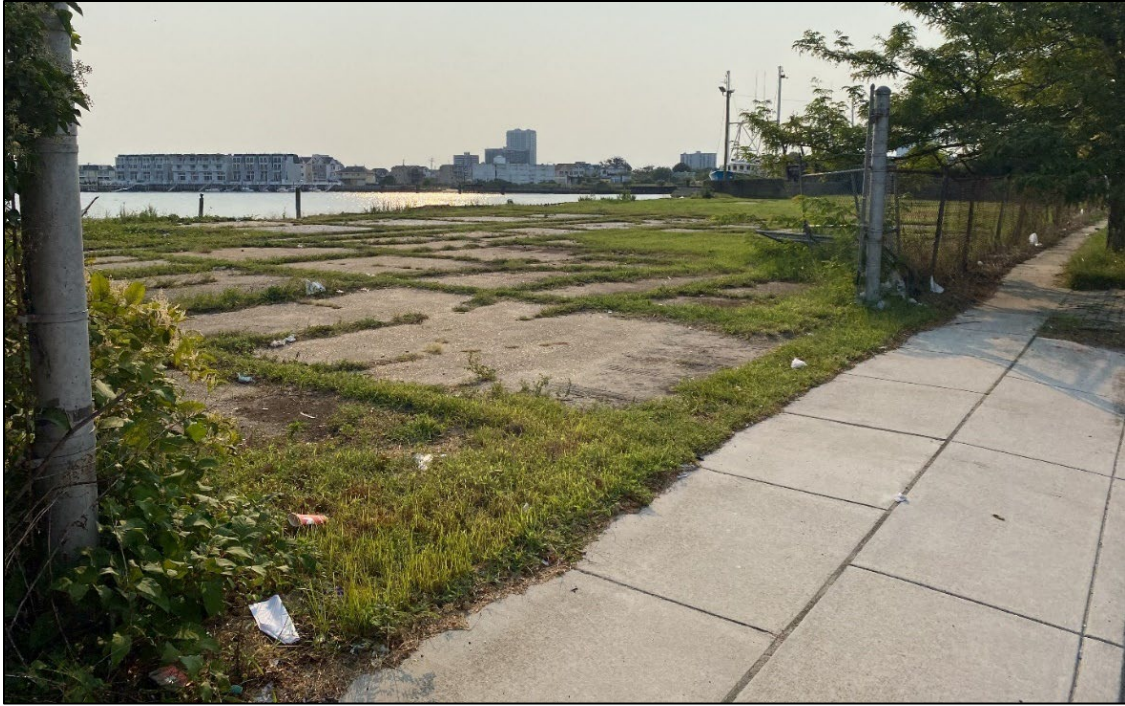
Overview of the shoreside parcel at 801 North Maryland Avenue with cracked concrete paving and chain link fence. View to the southeast.
